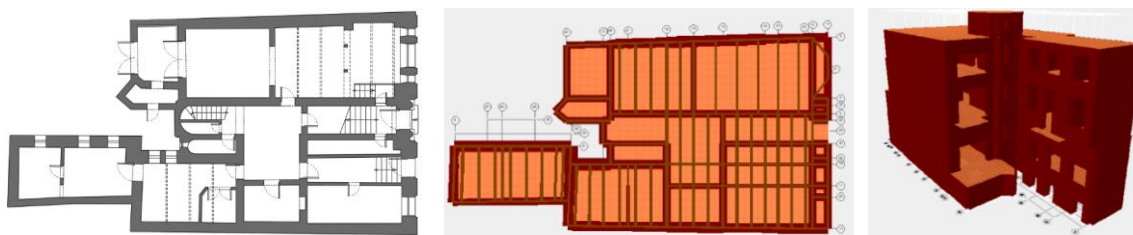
a) structural survey of the floor above the basement; b) 2D-ETABS model
